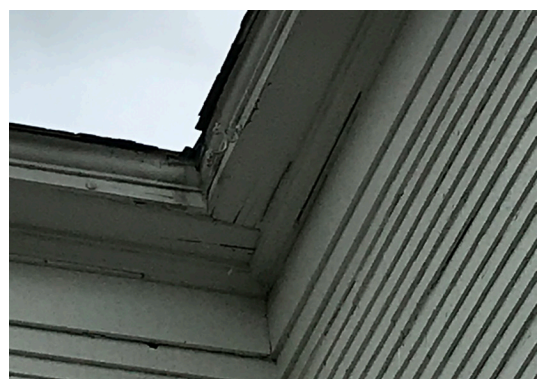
An inside-corner eave exhibits additional damage from the valley flashing's lack of gutter below.
